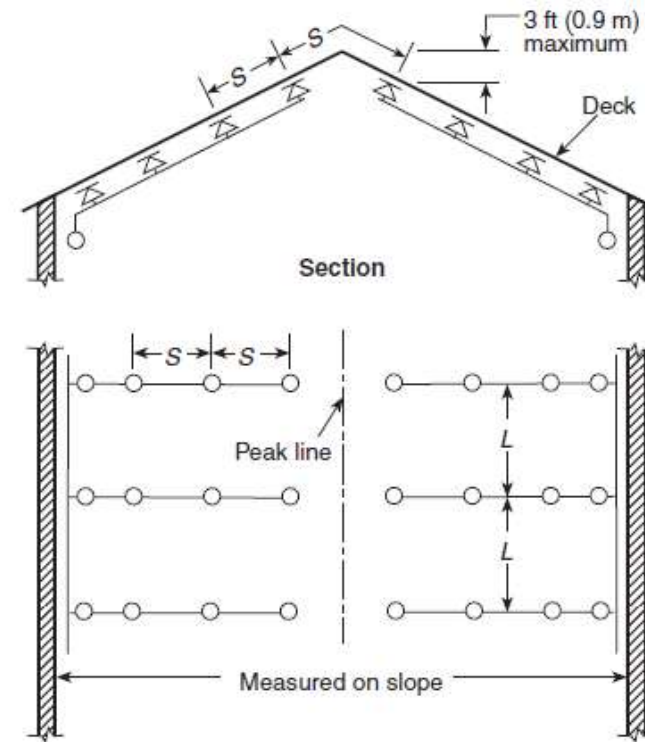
(b) Sprinklers at Pitched Roofs; Branch Lines Run Up the Slope.
